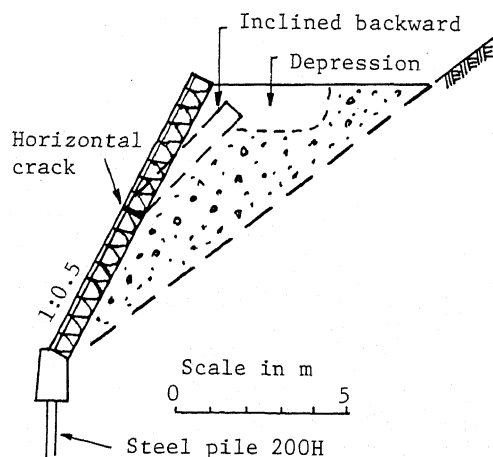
Broken concrete block retaining wall. Fig.2 Gravity walls tested.
